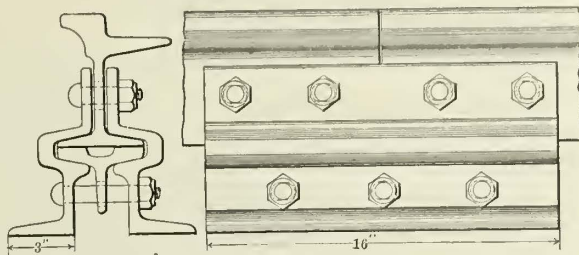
STANDARD GIRDER JOINT FOR HIGH RAIL.
